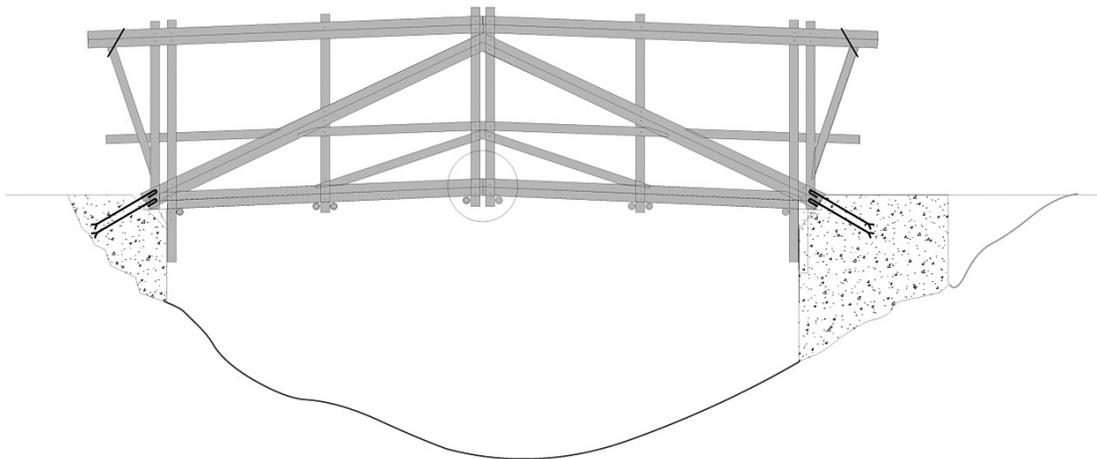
Front view of the Pre-camber in a Jörg Stamm bridge
